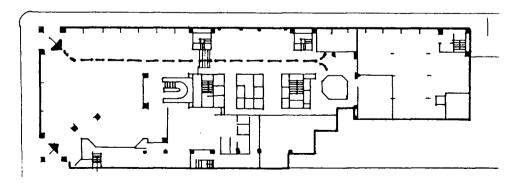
Hong Kong Bank: ground floor plan Source: Administration Office, Hong Kong Bank
